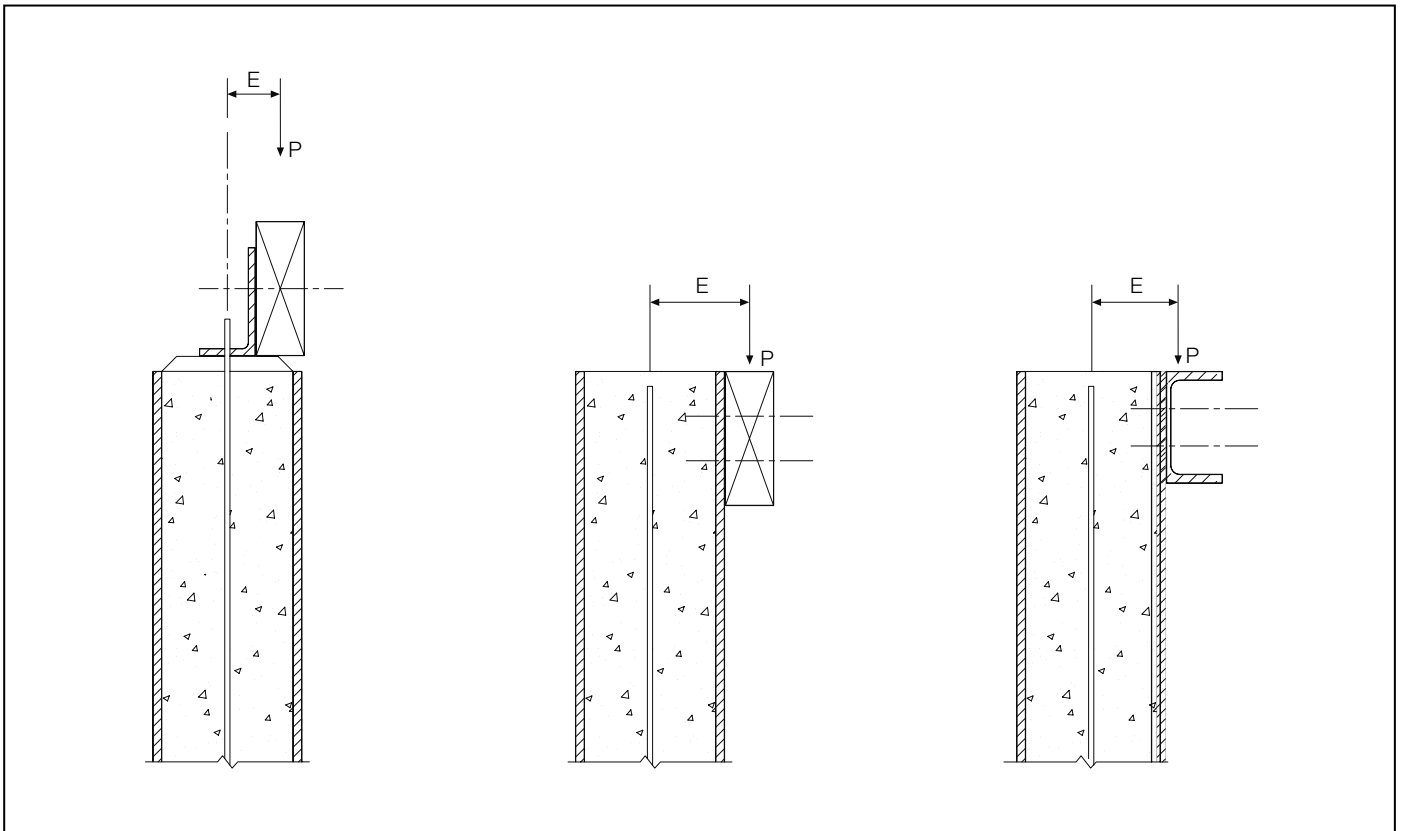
TYPICAL TOP CONNECTION DETAILS - $E_{MAX} = OD/2 + 50mm$
